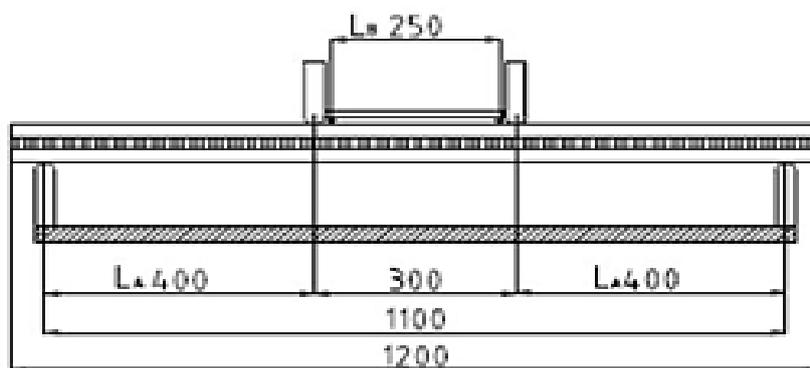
4-point bending tests on strip-shaped specimens cut off the series 1 CLT panels [22]
